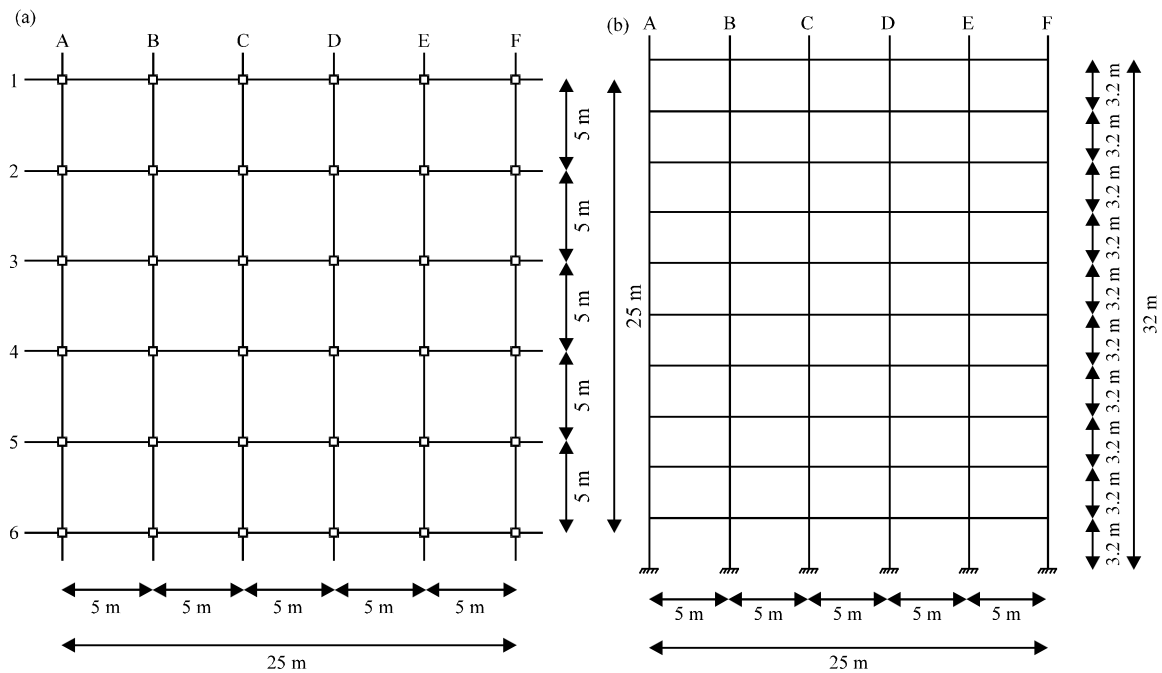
(a-b): Elevation and plane of the designed structure, (a) Plane and (b) Elevation view
